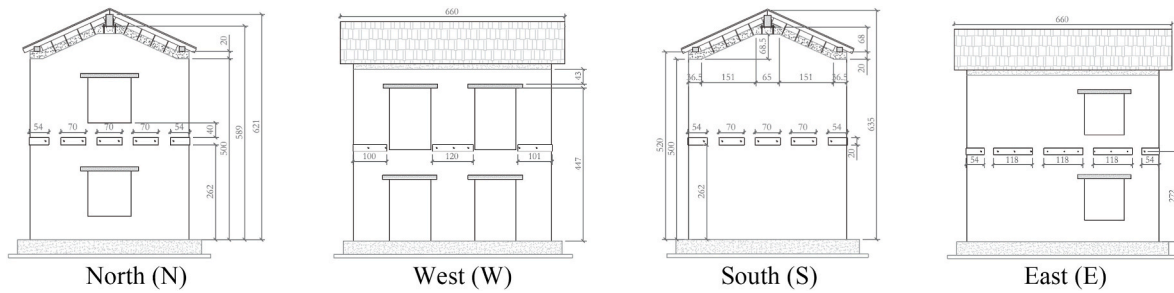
Elevation views of the walls of the Building 3 specimen (dimensions in centimetres) [8].
